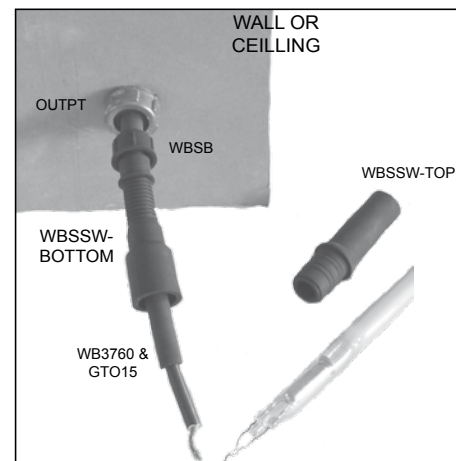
Slide bottom part of Wetbits Short Sleeve Wide over GTO cable and WB3760 sleeving assembly.
